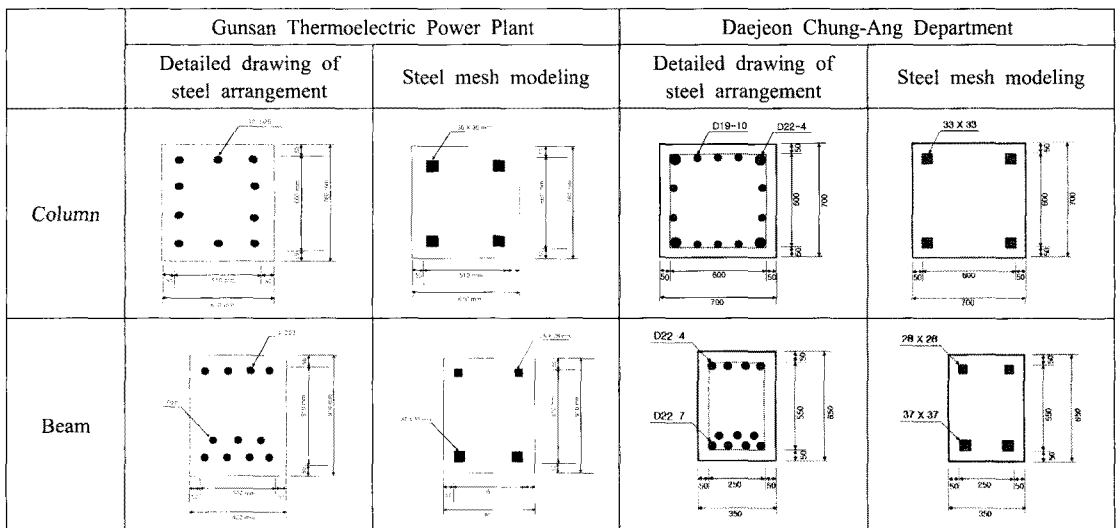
Simplification of the steel reinforcement arrangement in columns and beams (unit: mm)
